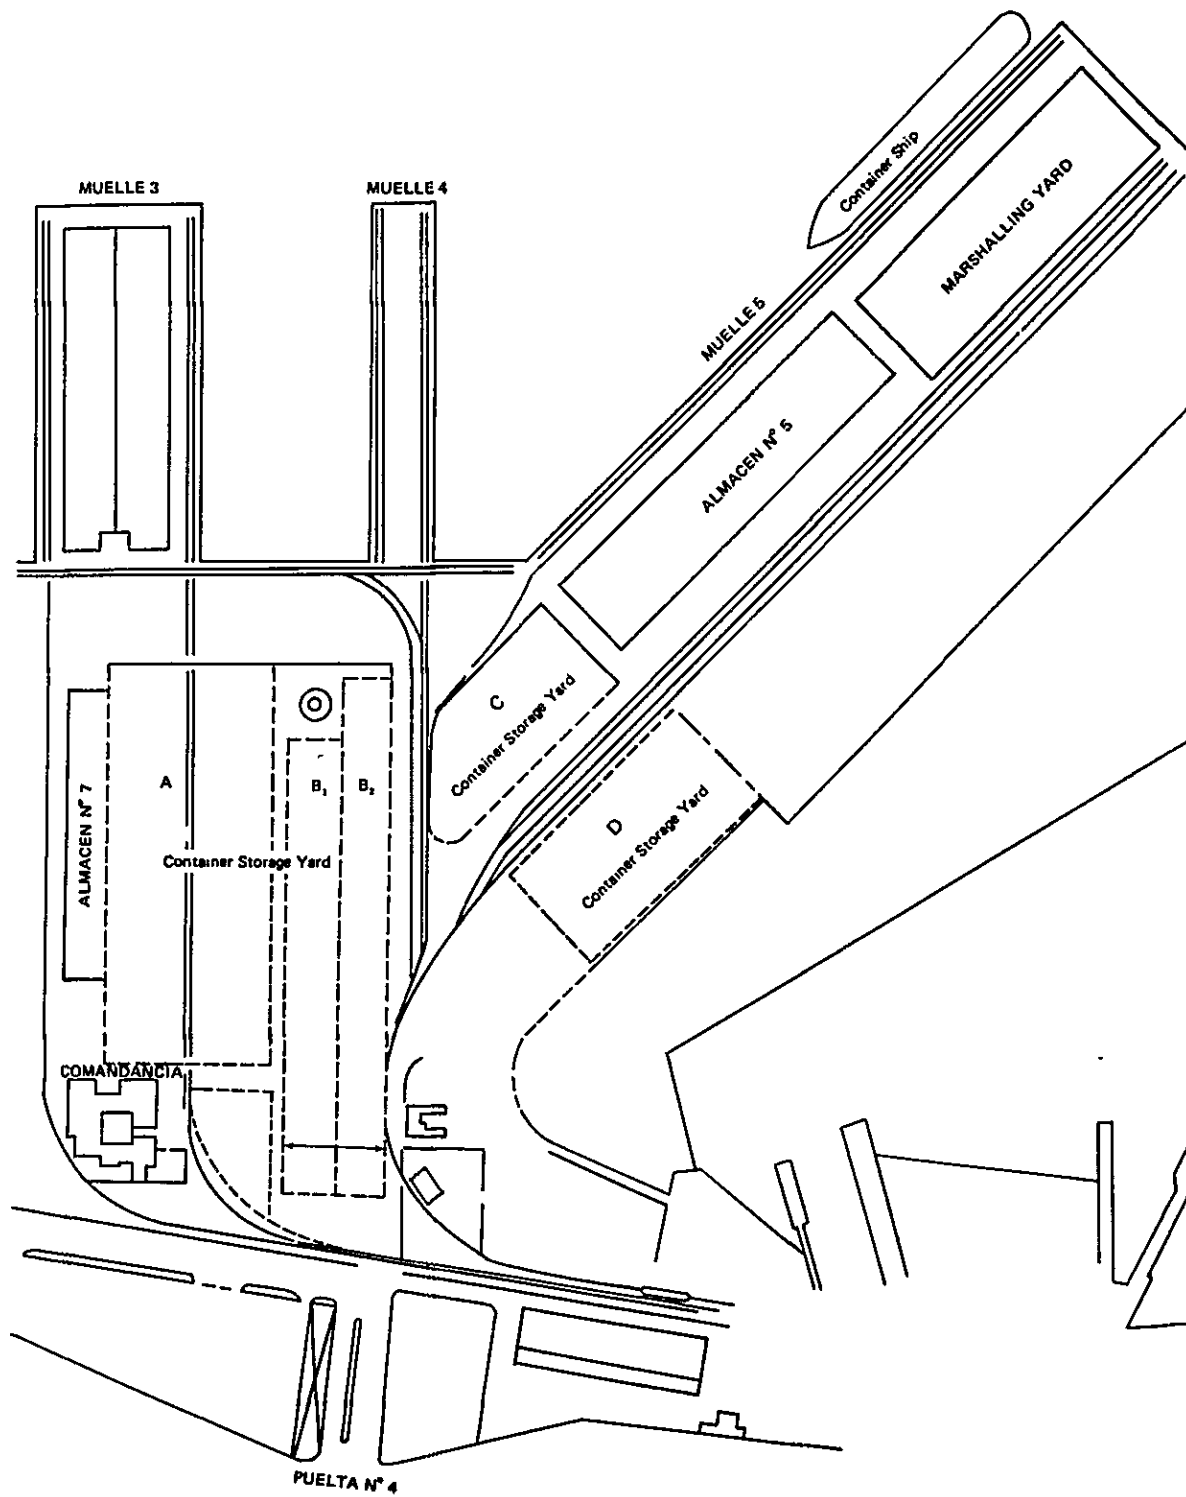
Container Handling Plan at No. 5 Wharf
